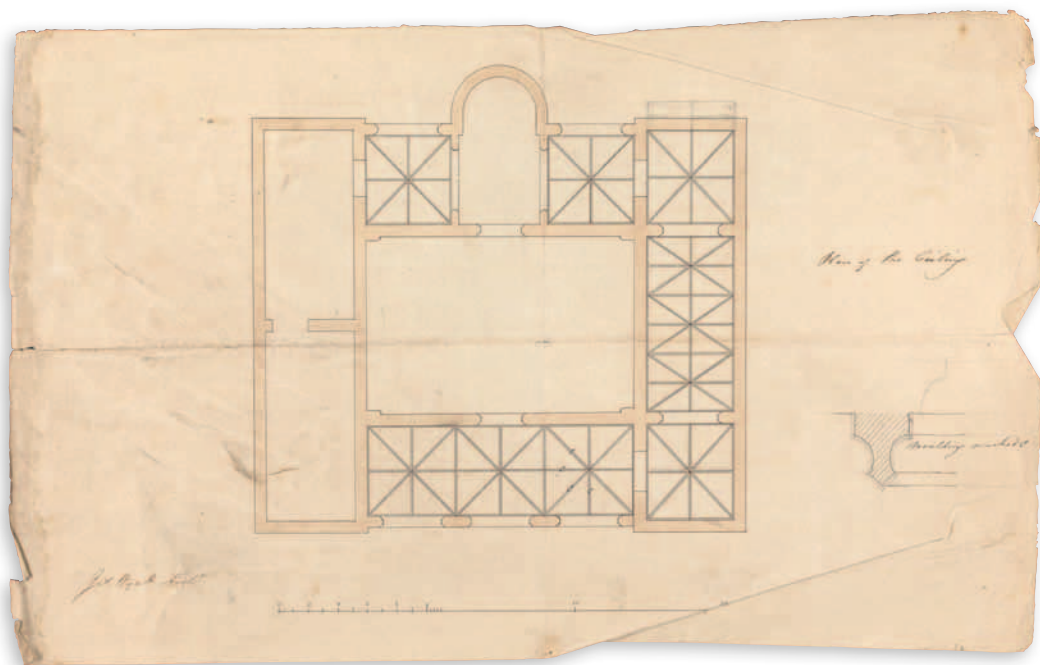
Layout for cloister ceilings, with section for the rib mouldings. (Yale Center for British Art, Paul Mellon Collection, B1977.14.834)
